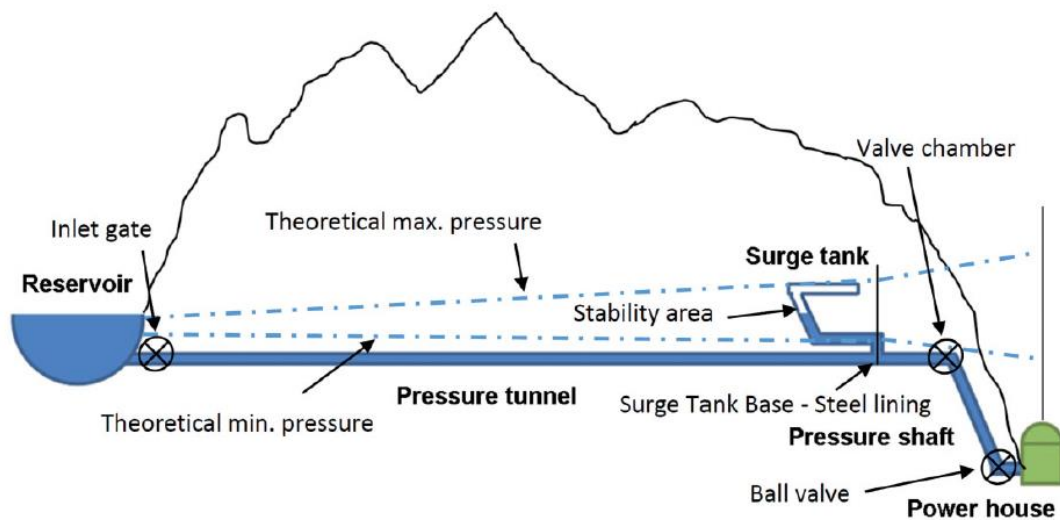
Schematic layout of a high head power plant (Richter et al., 2015)
